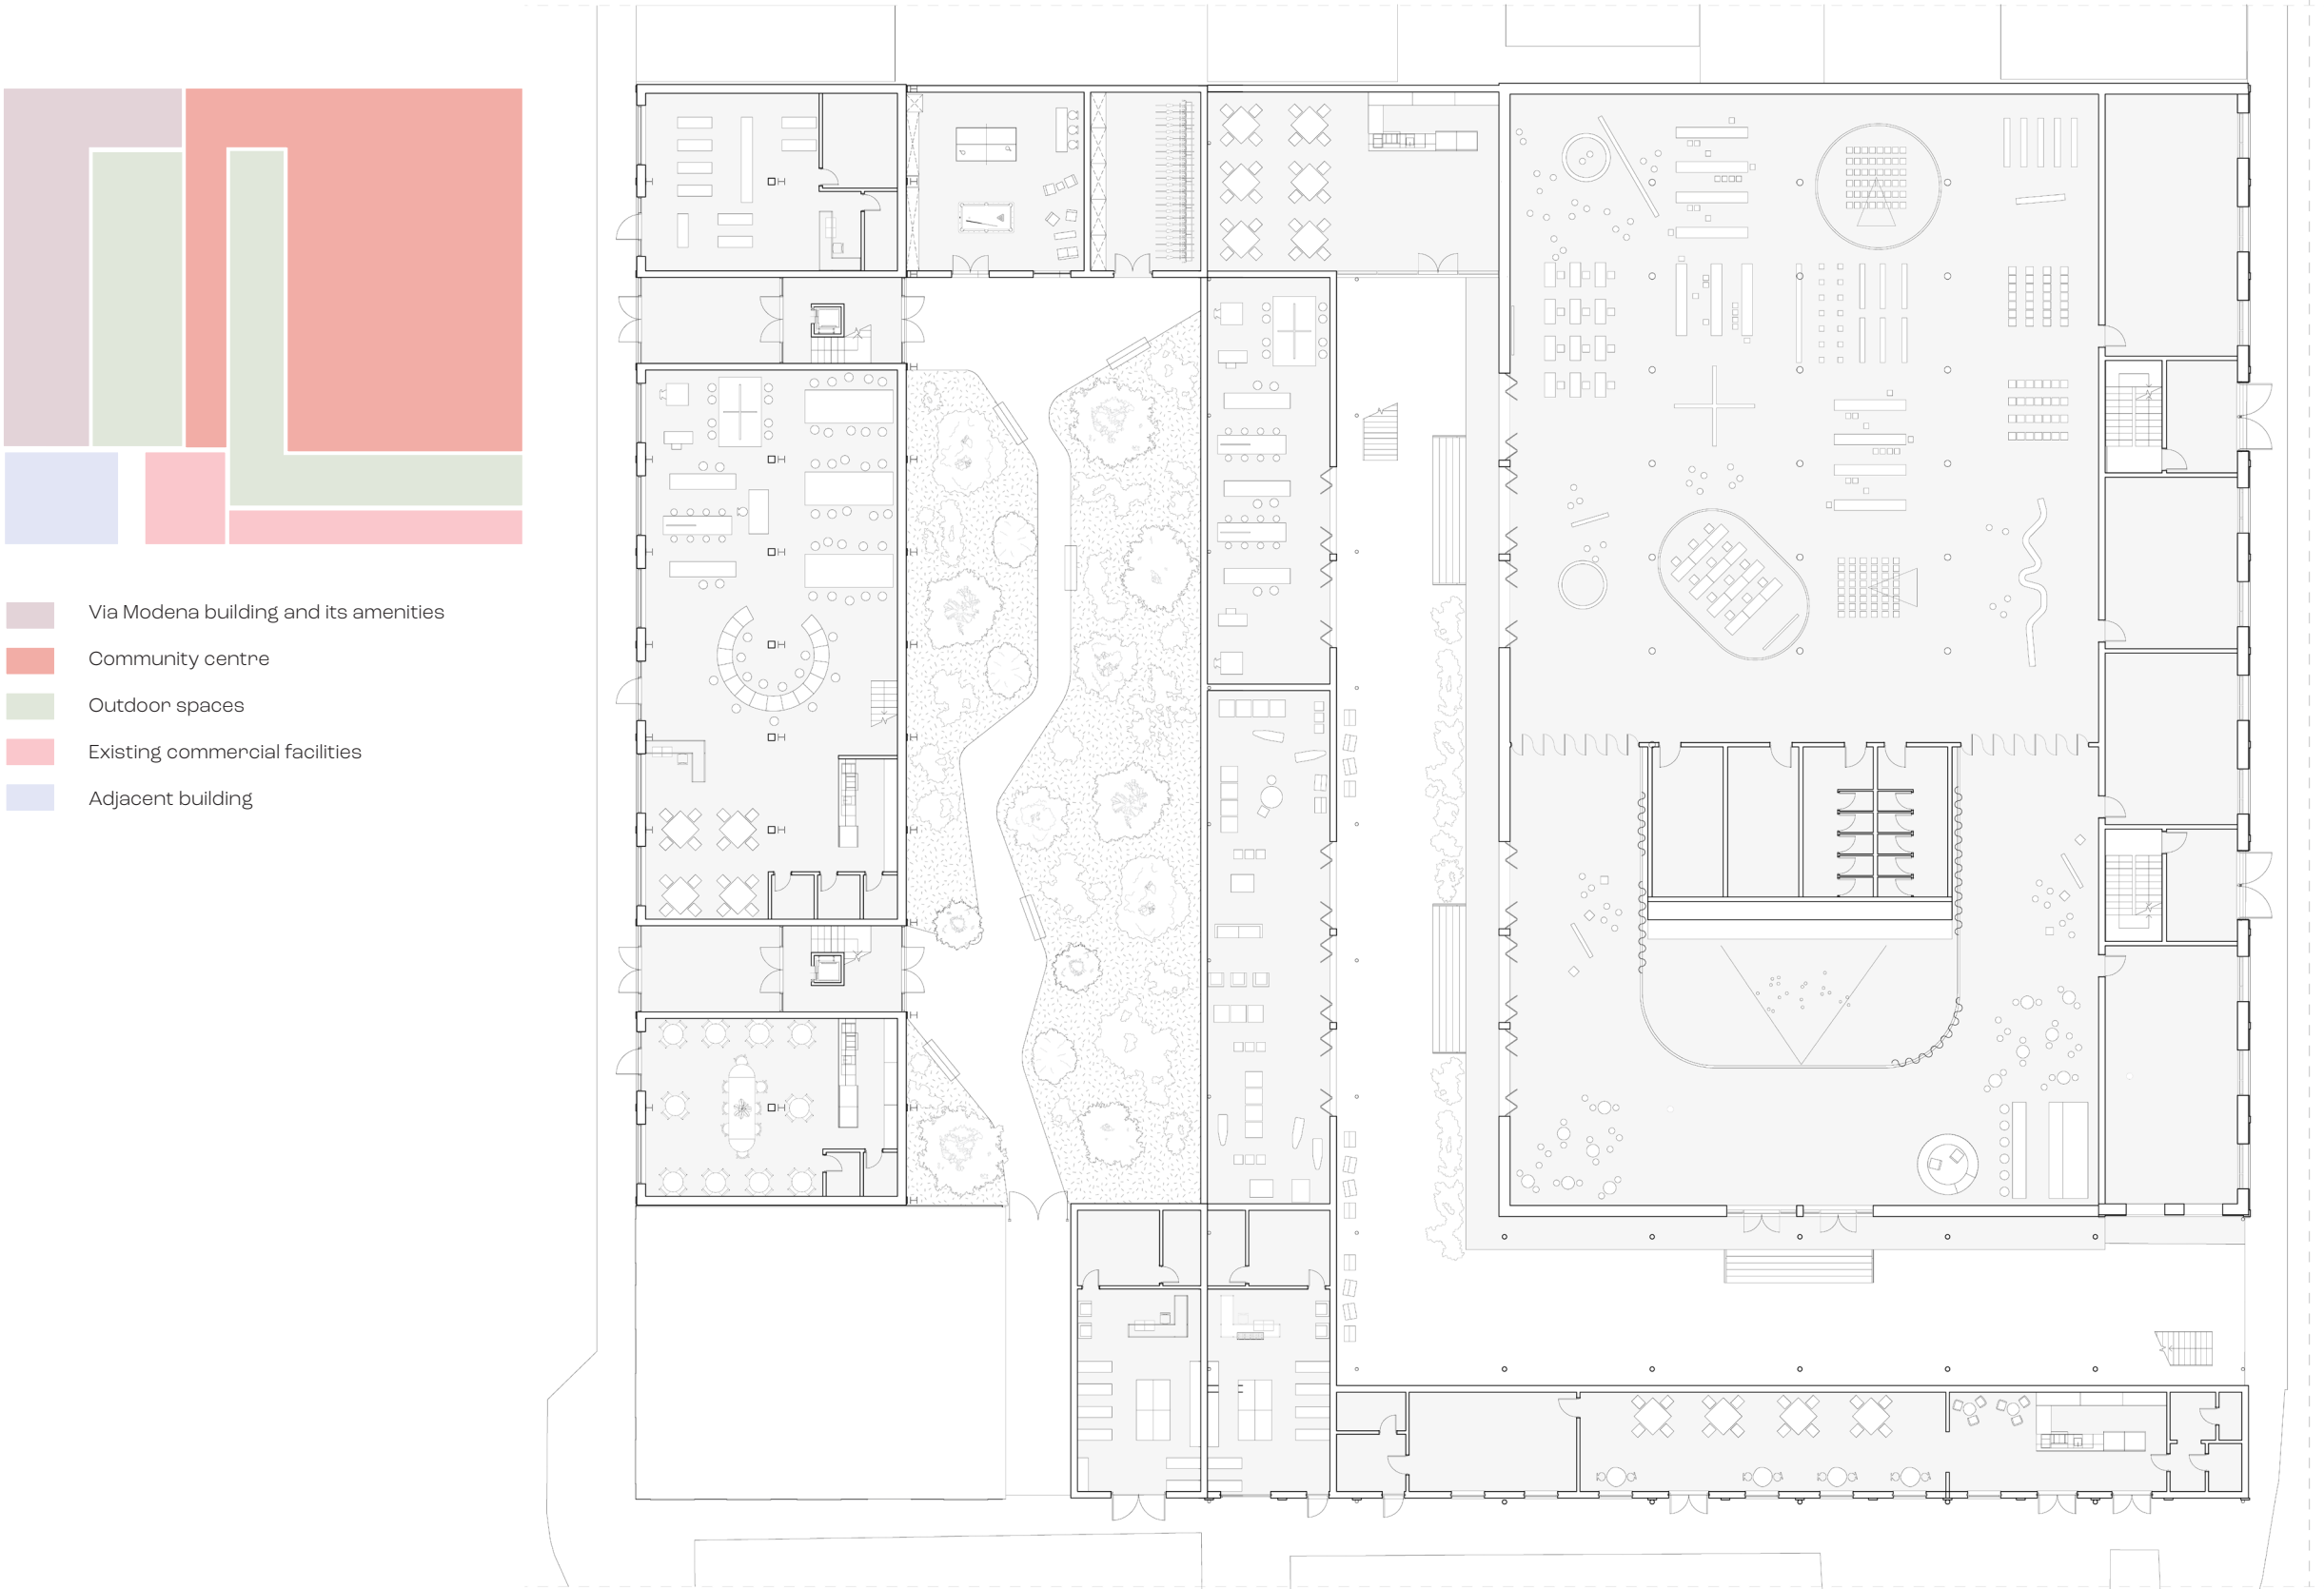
Ground floor plan plot scale - Source: Lina Milovidova 2025
